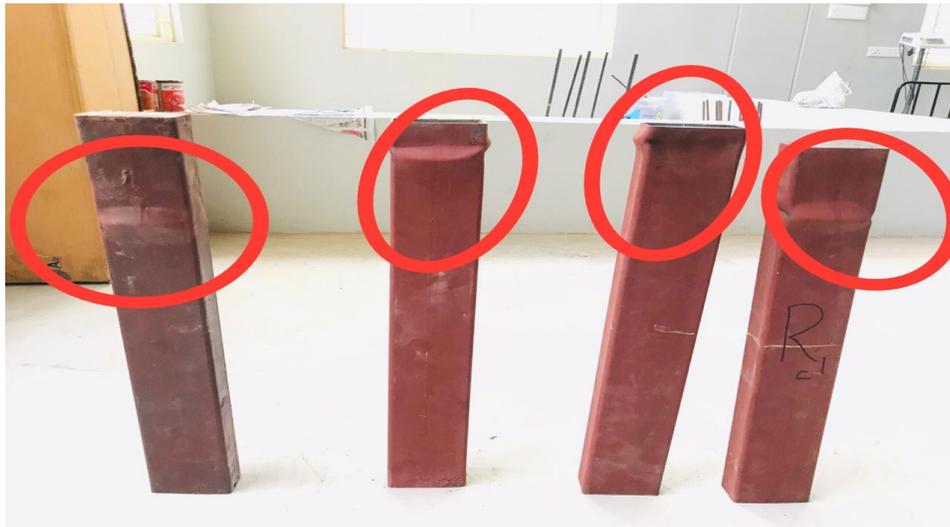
, Failure mode of Rectangular Specimen (600 Mm Short Columns)
